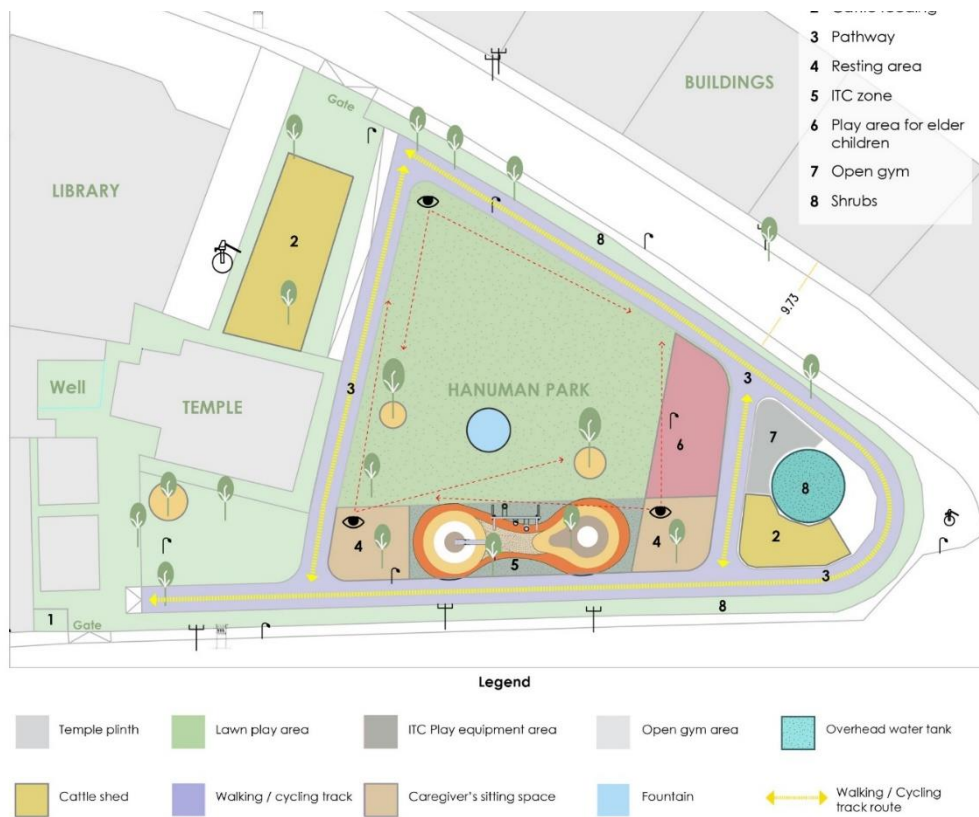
Proposed plan for the anchor institute (Hanuman Park)
